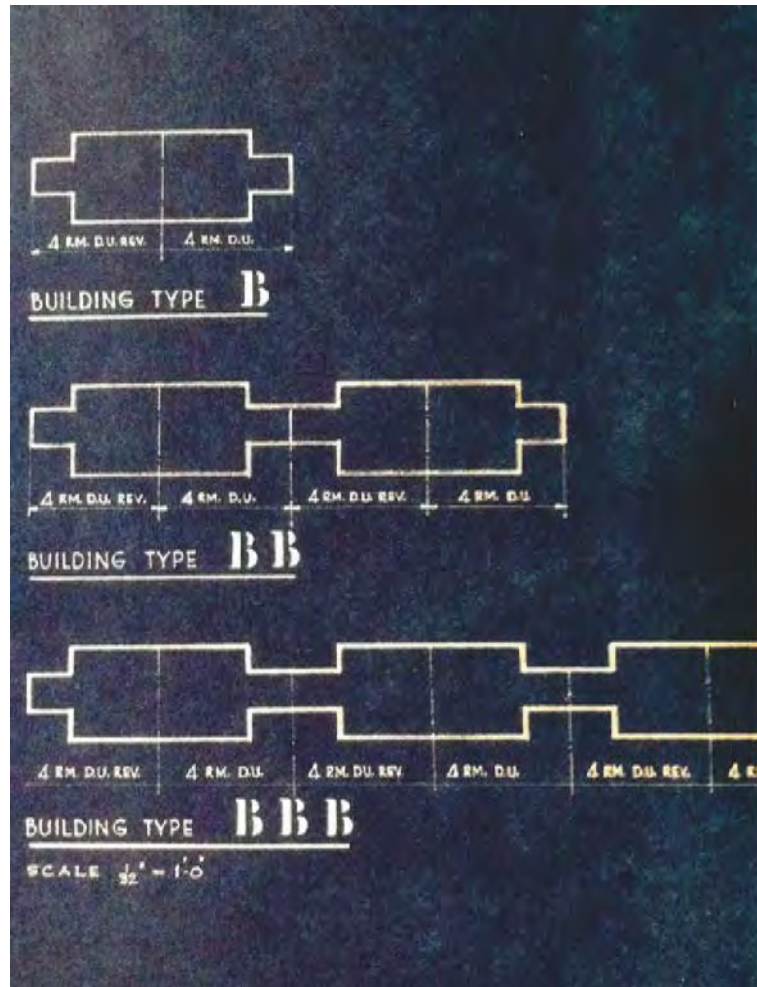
and 12b and c: Arrangement for Plans B, BB, and BBB above, and entry details for newly-completed Plan B houses.
